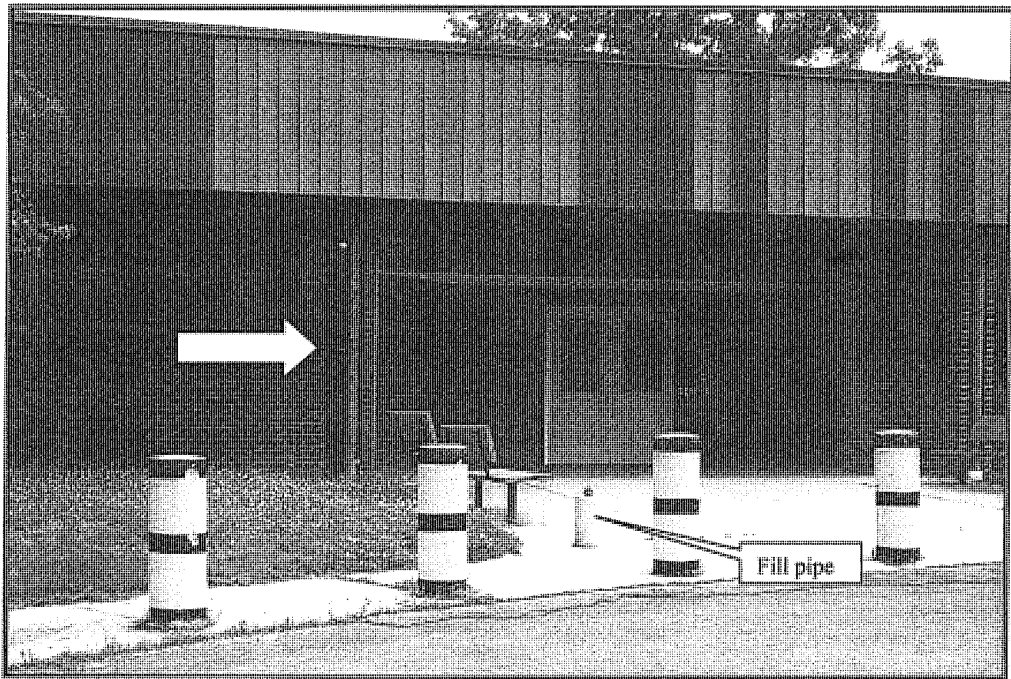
UST (6U) fill and vent pipes outside entrance to Site 7.
